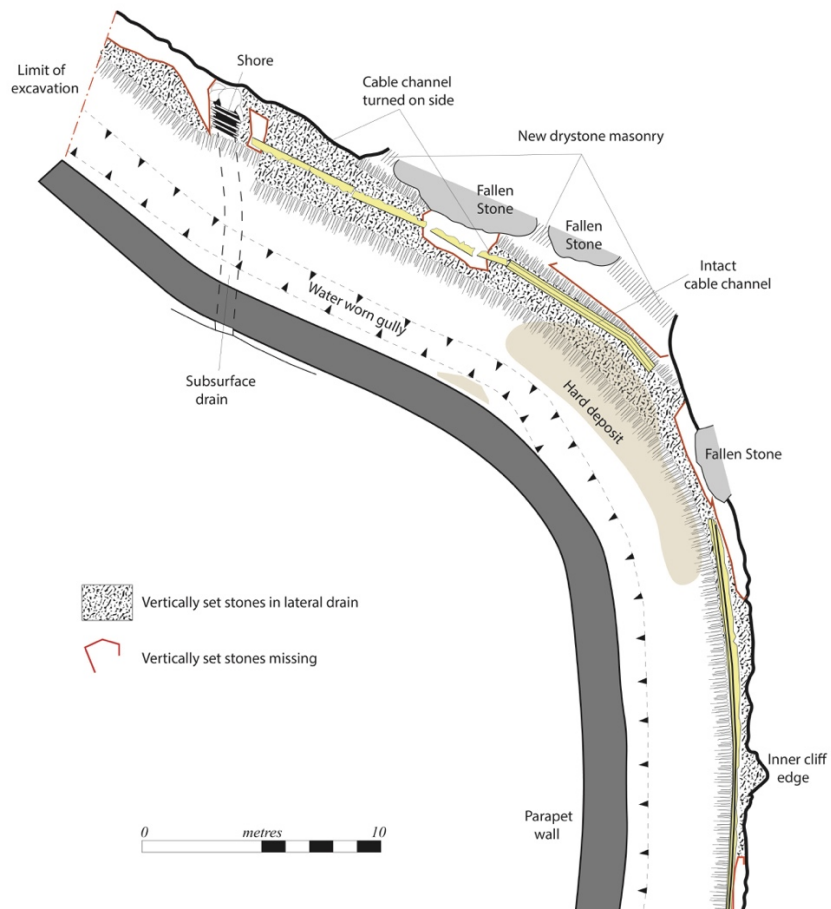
Plan of excavated roadway at location of Crash deck 3.
